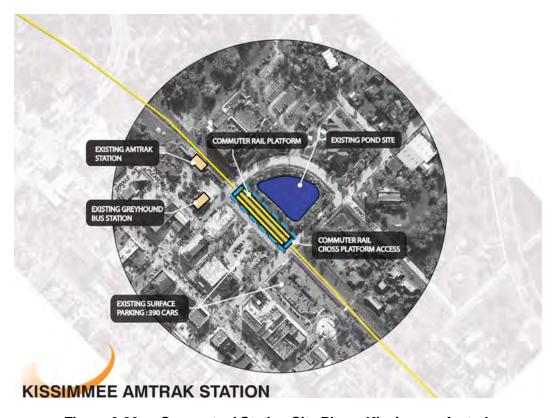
Conceptual Station Site Plan – Kissimmee Amtrak
